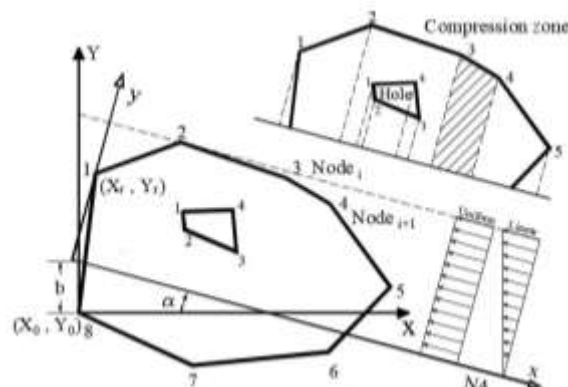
Footing Plan View and Typical Neutral Axis Location
